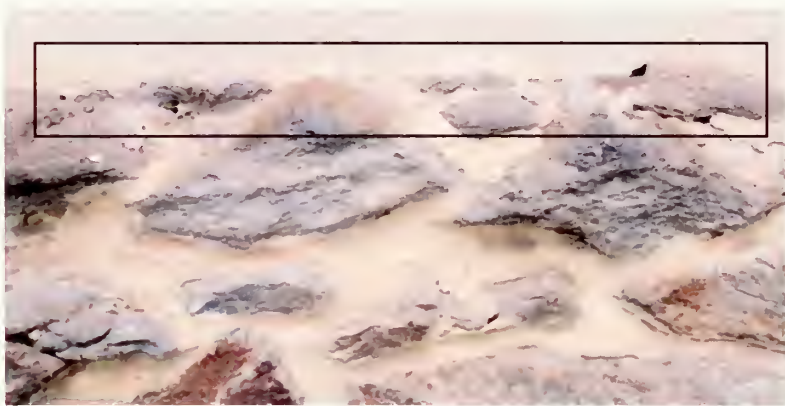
The exposed ledge of the foundation wall should be covered with mortar with a slope away from the building.
